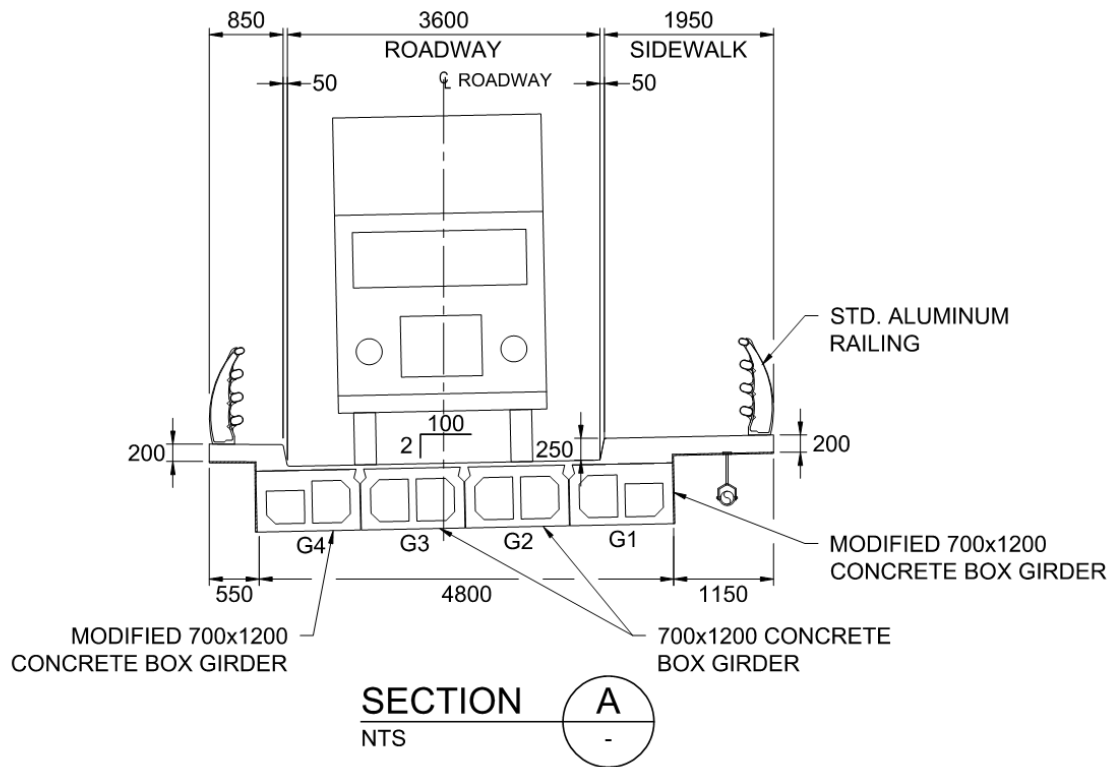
Bayview Place Bridge over Alberta Creek – Section
